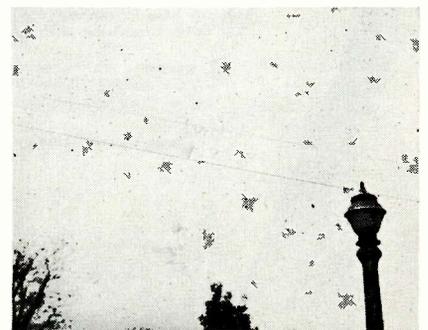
Showing the messenger wire and the program line separated after removal of hemp cord.
